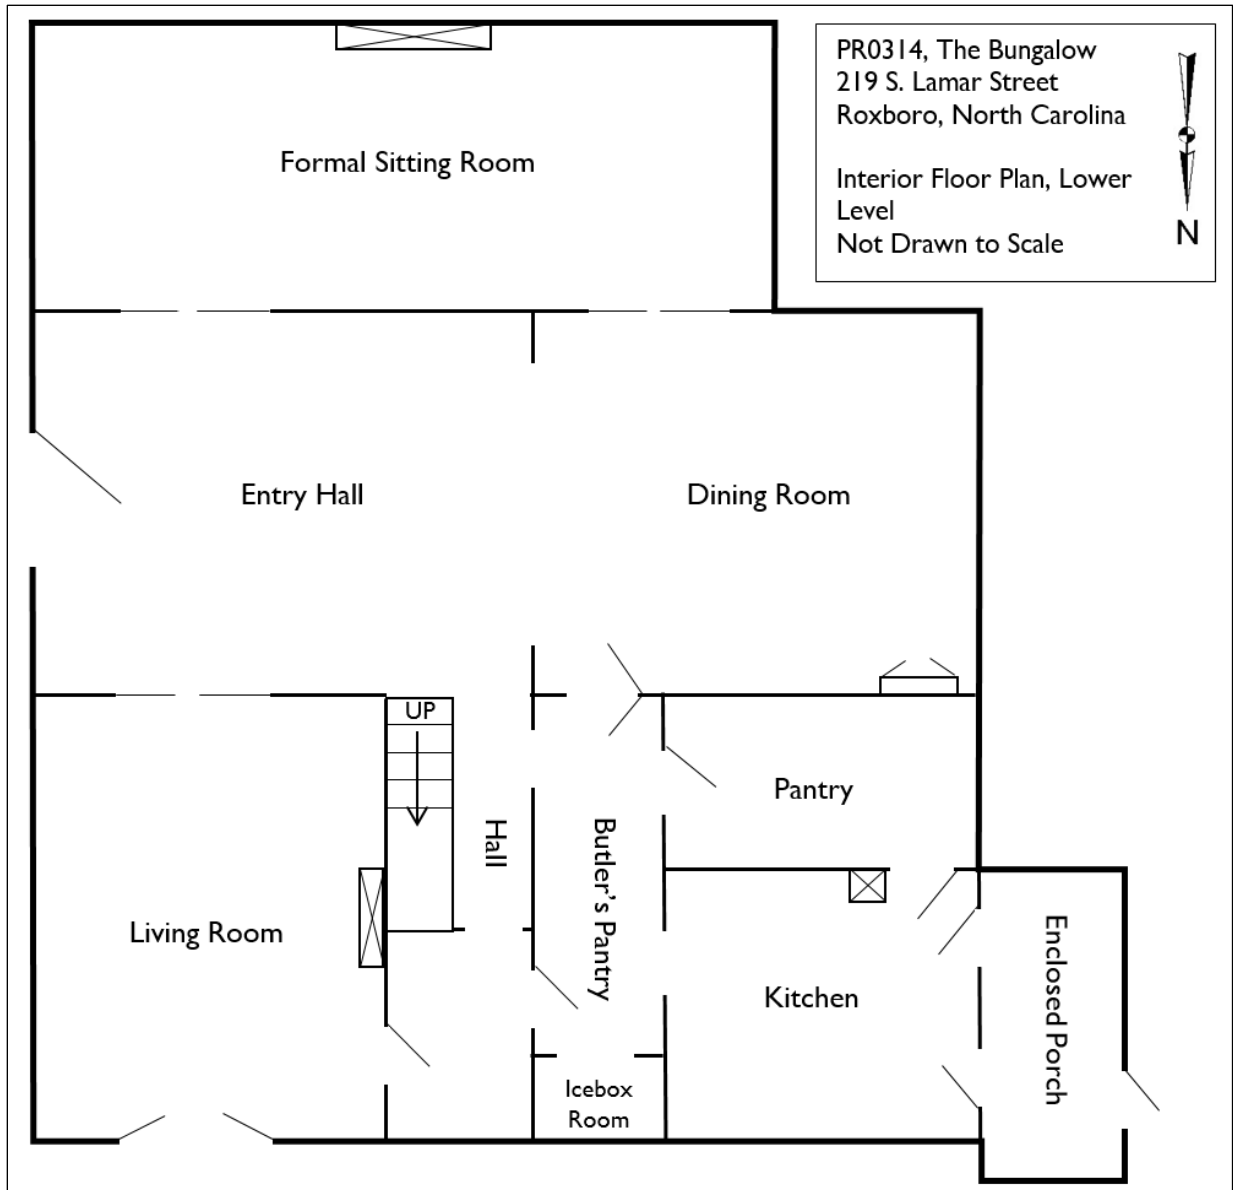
Lower Level Floor Plan of The Bungalow (PR0314).
